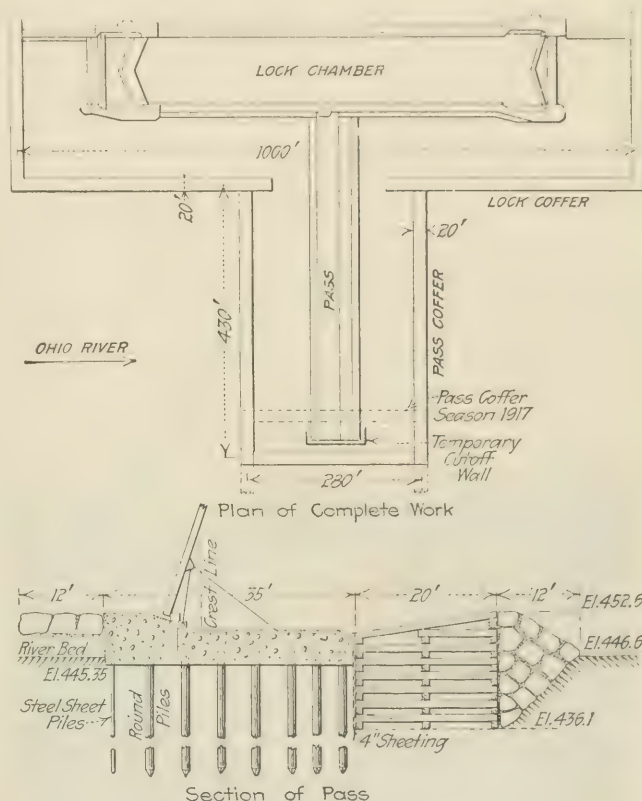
LAYOUT OF WORK AT DAM 33, OHIO RIVER
